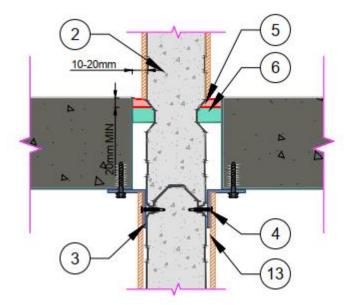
Dual wall system with vertical wall between horizontal walls – gap width of 10-20 mm between the stair and horizontally oriented wall
